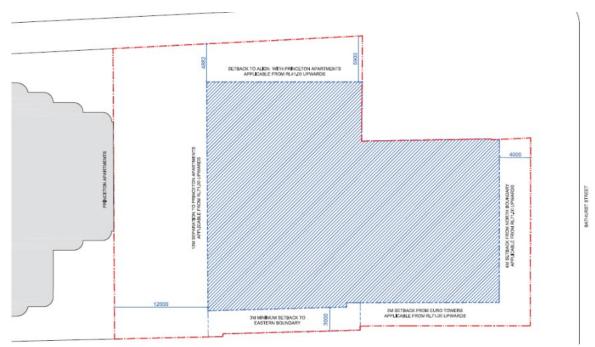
OSD approval building envelope (Bathurst Street elevation)
